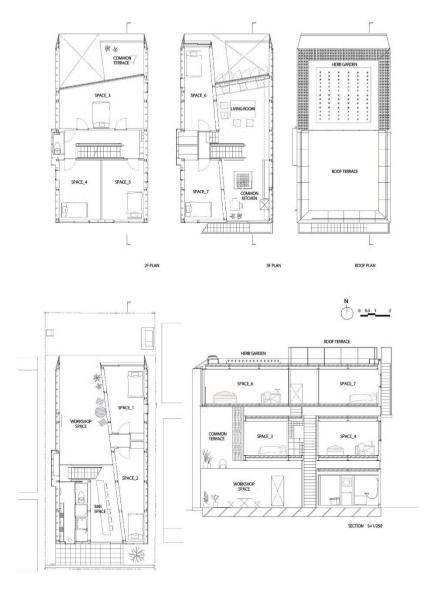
Yaraicho share house ground floor, first floor, second floor and roof-top plan with longitudinal section; [Provided with approval by Spatial Design Studio: Satoko Shinohara, 2012]
